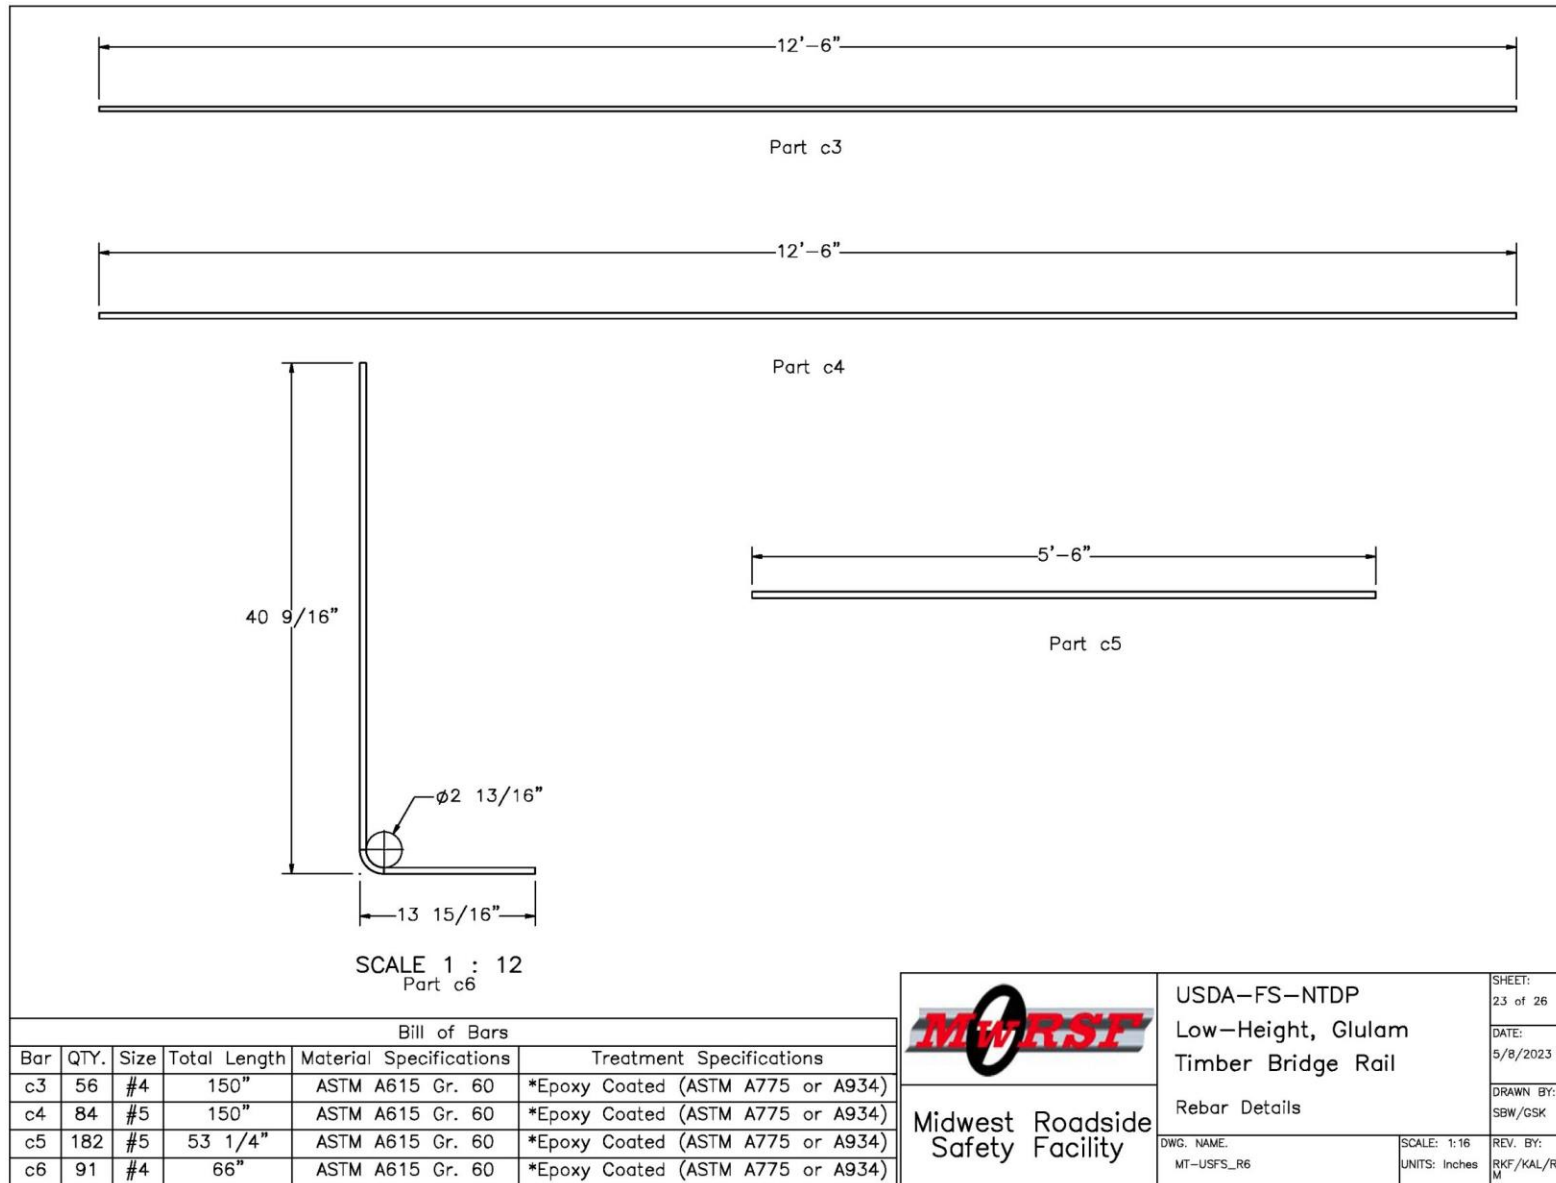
USDA-FS-NTDP Low-Height, Glulam Timber Bridge Rail: Rebar Details
